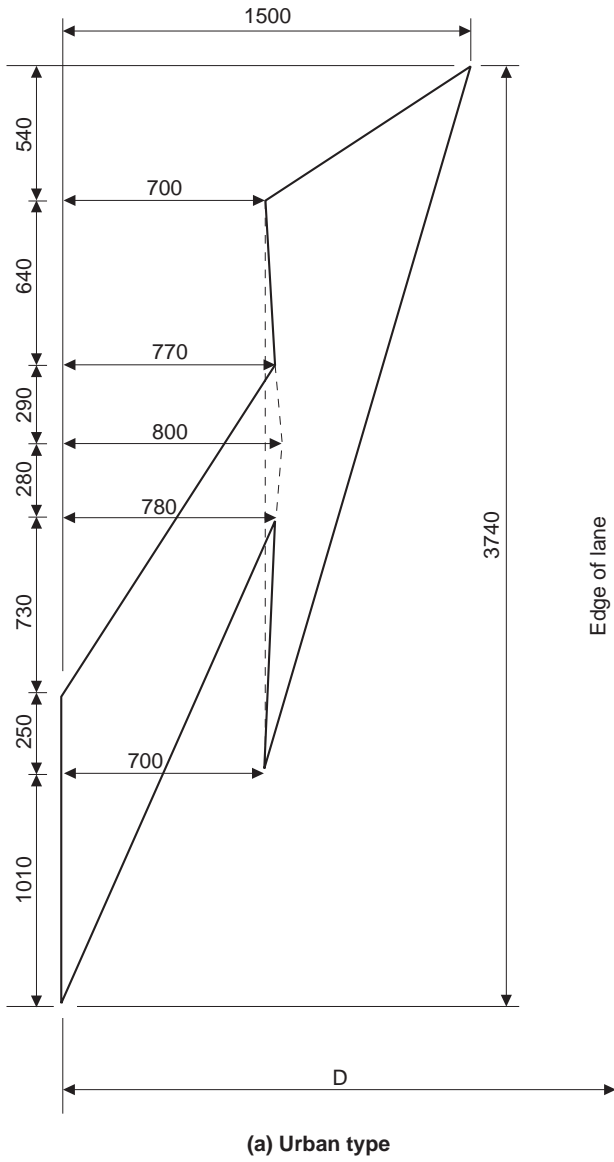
INTERSECTION PAVEMENT ARROWS – SPECIAL TYPES
